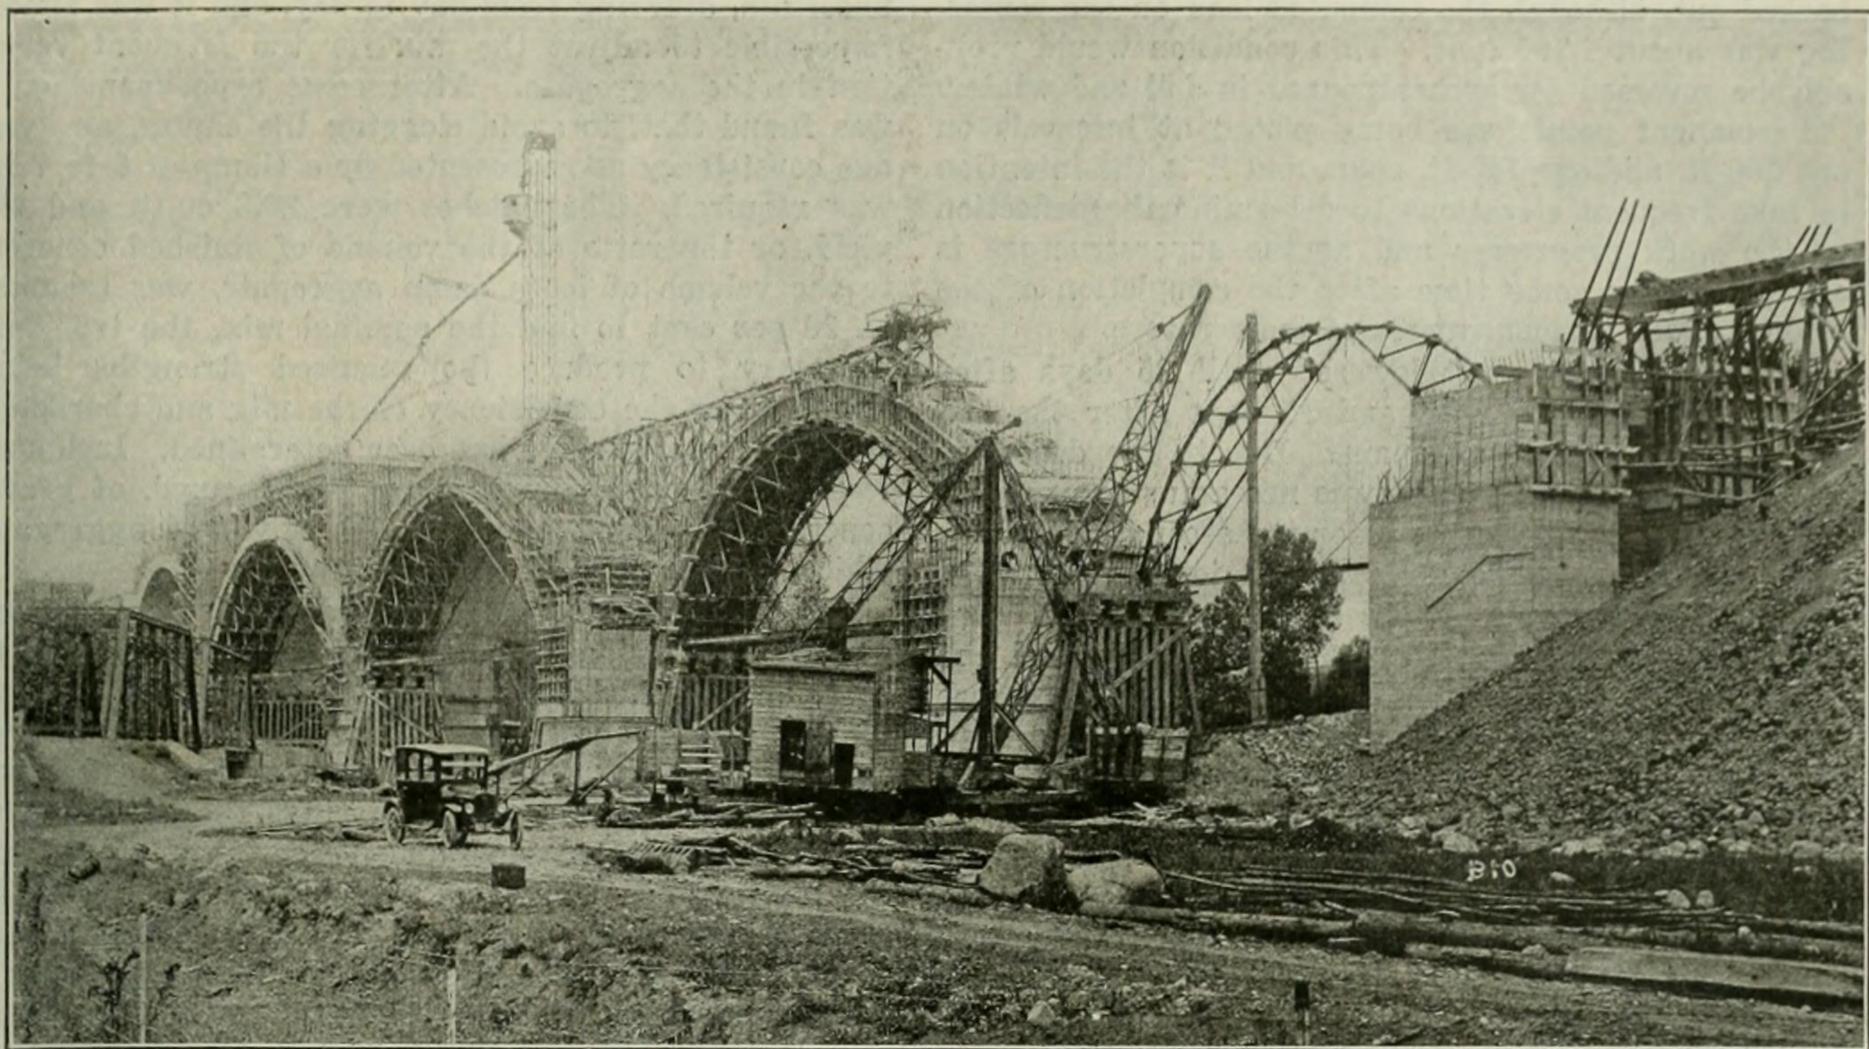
CONSTRUCTION WORK AT BRIDGE SHOWING ARRANGEMENT OF PLANT AND ARCH CENTERING
